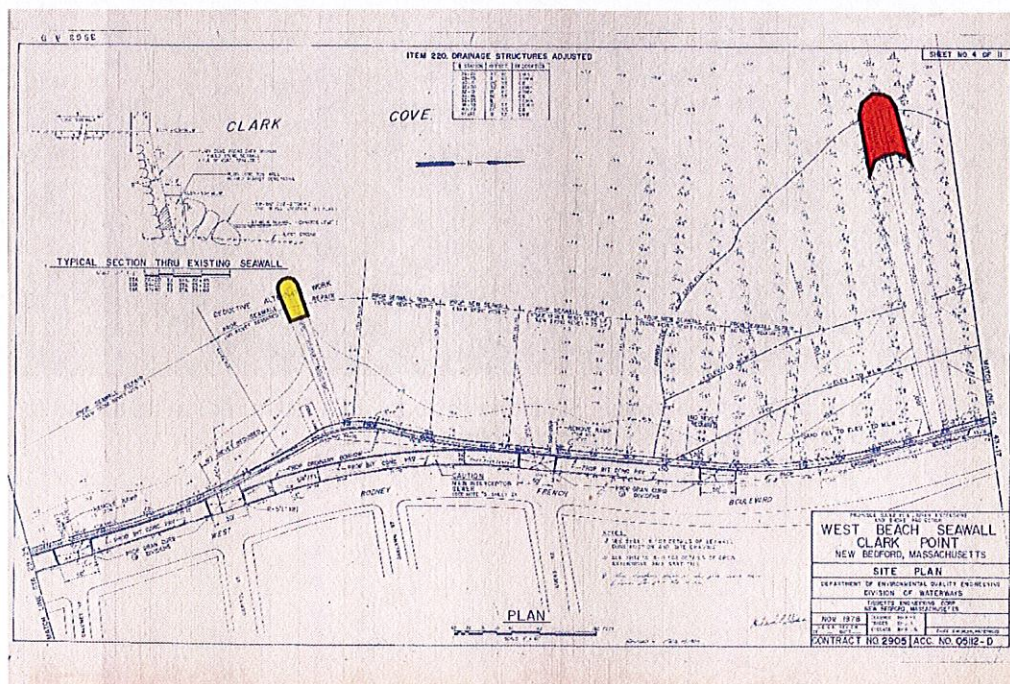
Tibbetts Engineering 1978 plan of West Beach. The footprint of the Groin 4 (right) extension to be removed is shaded in red. The tip of Groin 5 (left) shaded in yellow will be adjusted to the adjacent breakwater T-head section.
